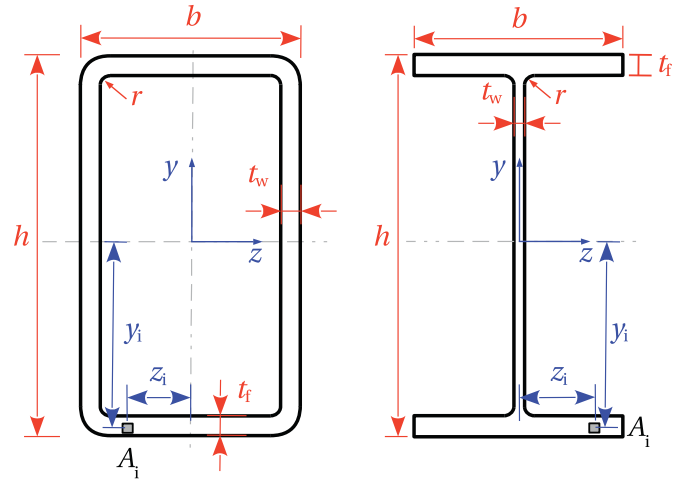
Discretisation of rectangular hollow sections and I-sections.
